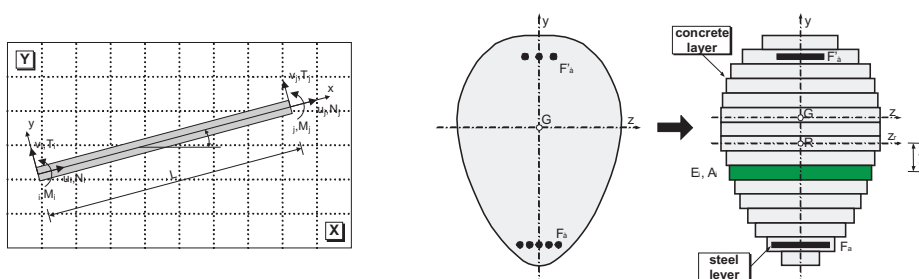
Beam FE DOF and finite layers discretization of a beam FE cross-section
